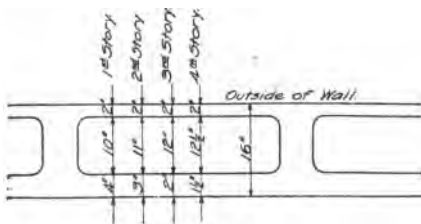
TYPICAL HORIZONTAL SECTION WALL JOINTS.
